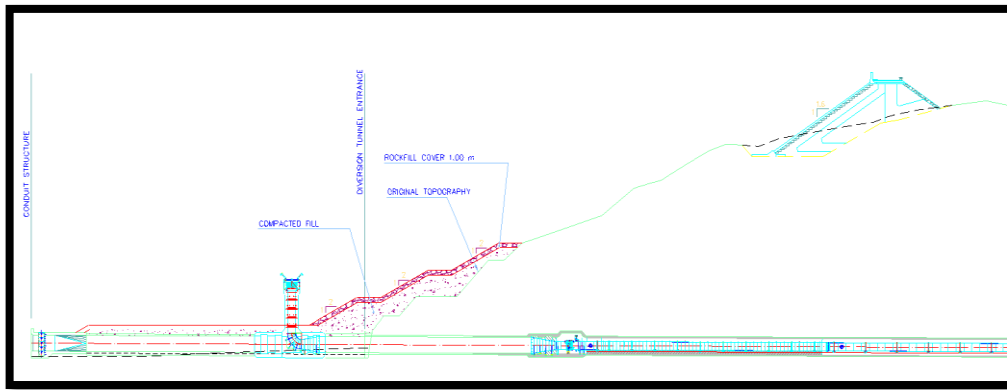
Longitudinal profile of the diversion tunnel and conduit system showing the transition from tunnel to cut-and-cover conduit
